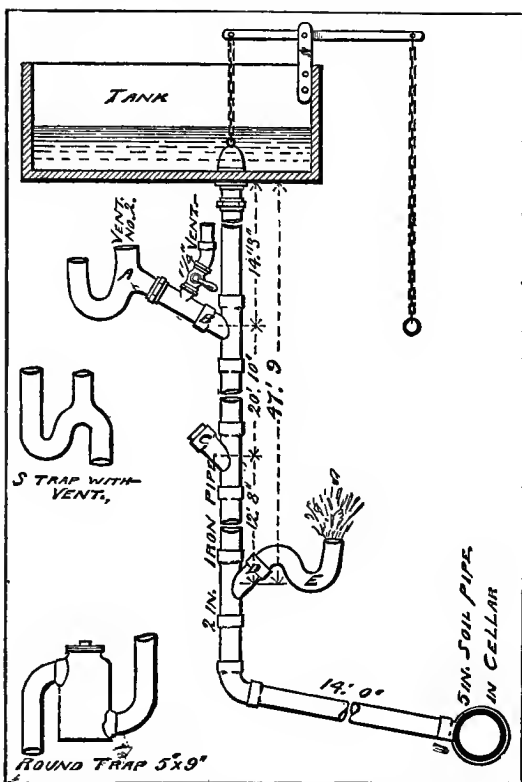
Trap Vent Pipe 125 ft. long in a tall Apartment House.
